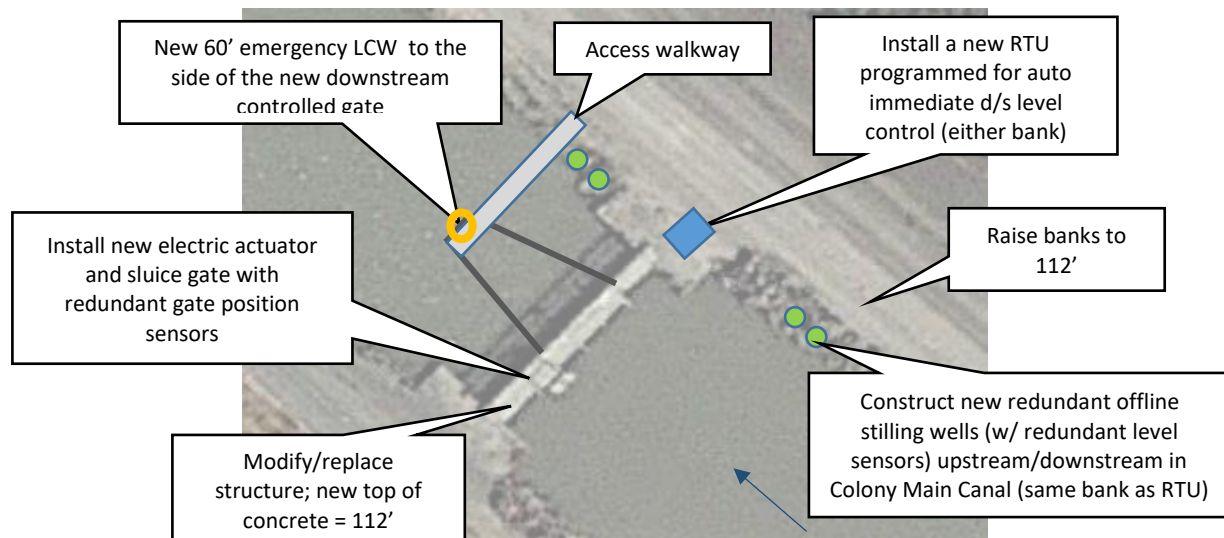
Proposed modifications to the existing flashboard check structure downstream of the Colony Main Canal Reservoir, plan view
